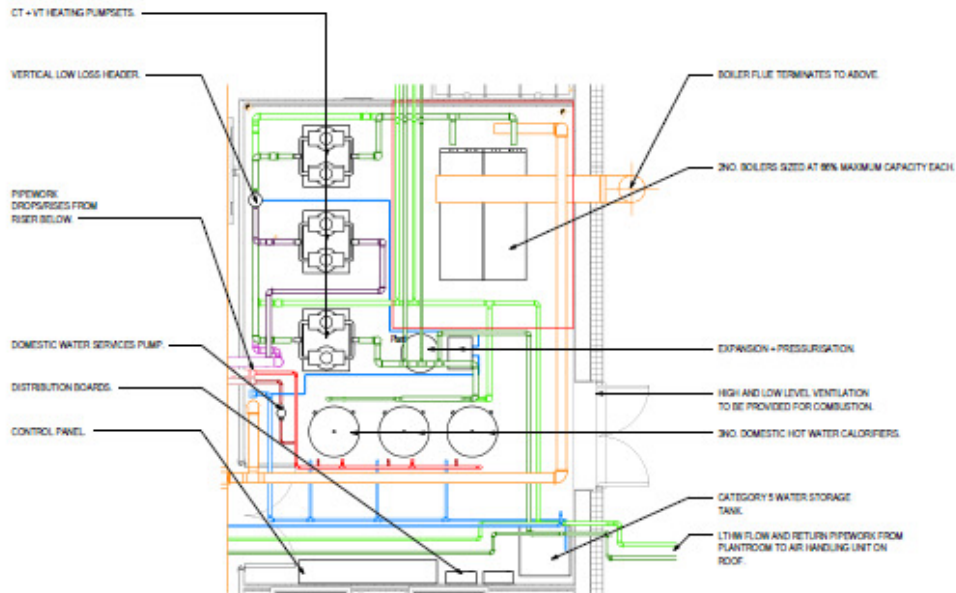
Second Floor (44.5m²) Plantroom Layout – Turing House School
